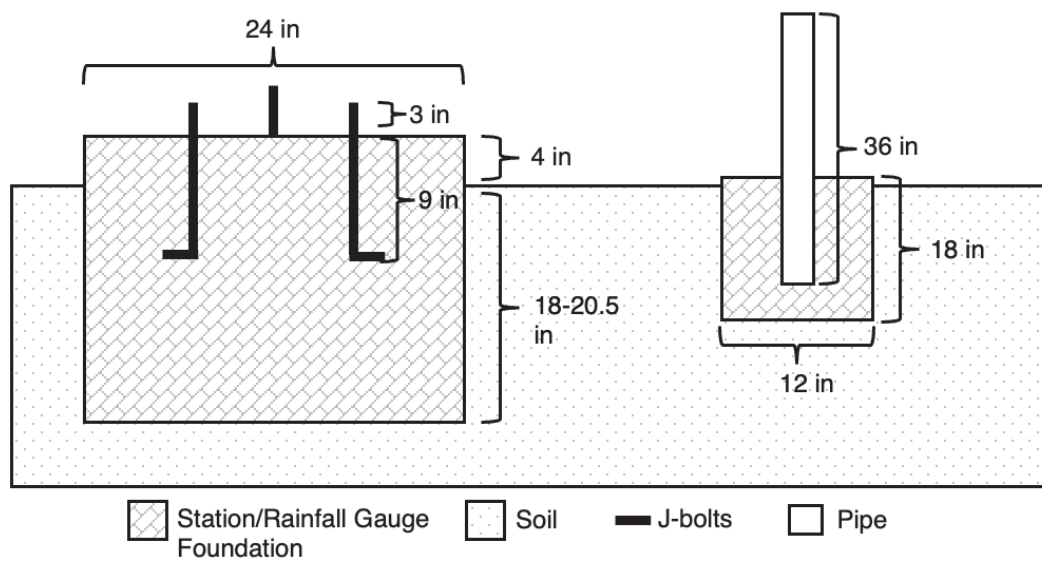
Schematic showing approximate dimensions for the concrete station foundation and rainfall gauge foundations.
